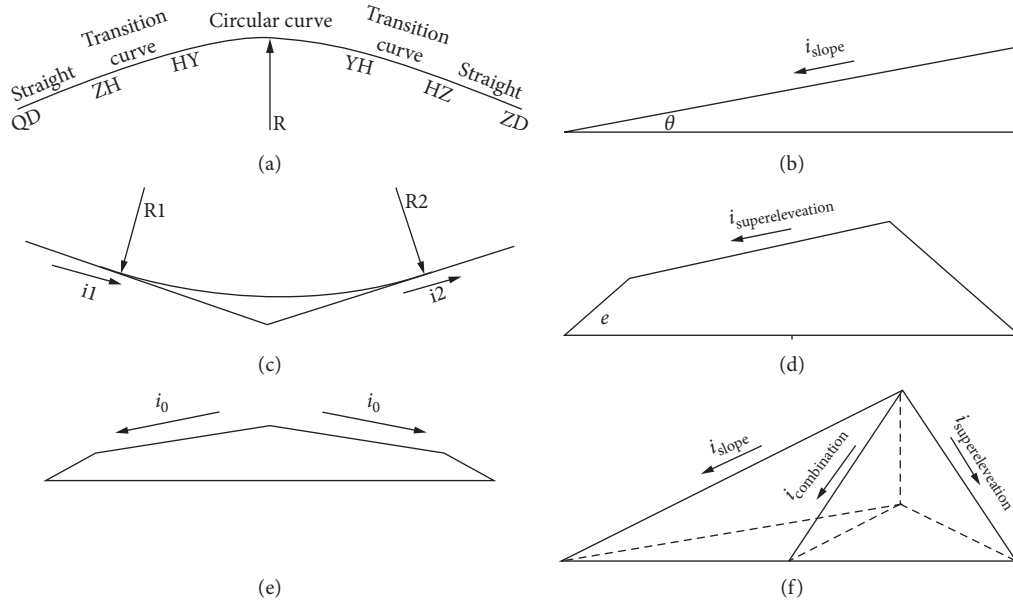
Road geometric design. (a) Horizontal curve. (b) Longitudinal slope. (c) Vertical curve. (d) Superelevation. (e) Road crown. (f) Composite longitudinal slope.
